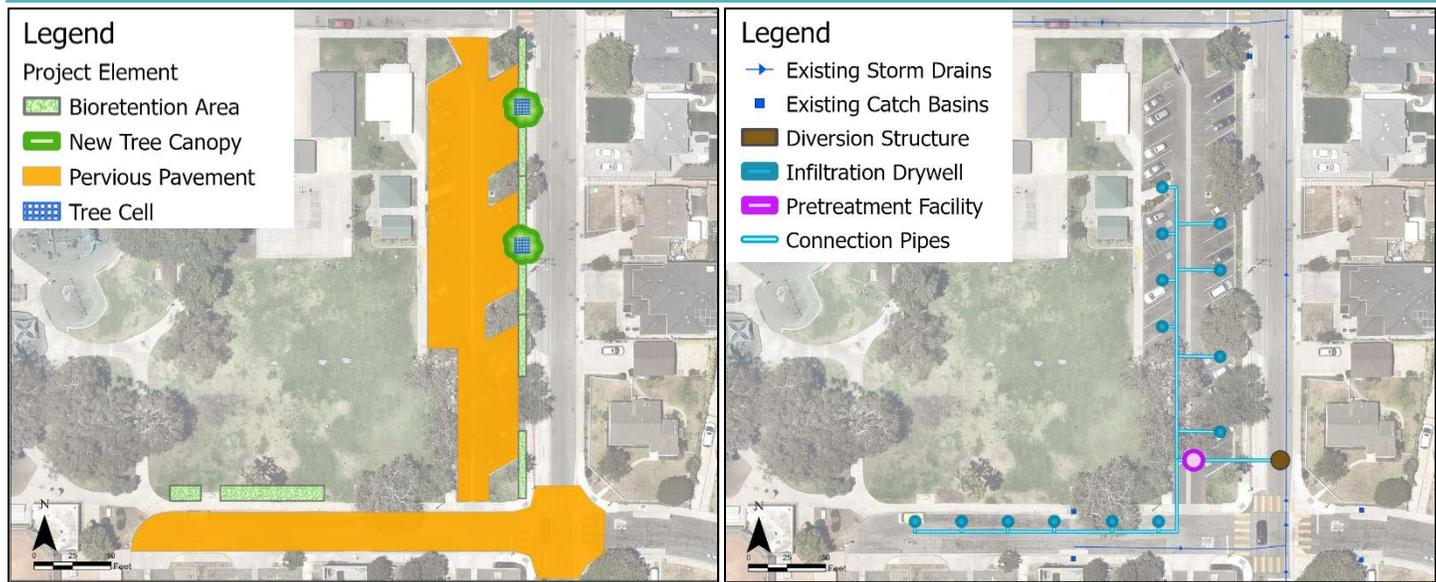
Surface (Left) and Subsurface (Right) Project Site Layout
